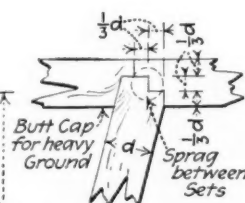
Detail of Joint for a Framed Set in Heavy Ground
